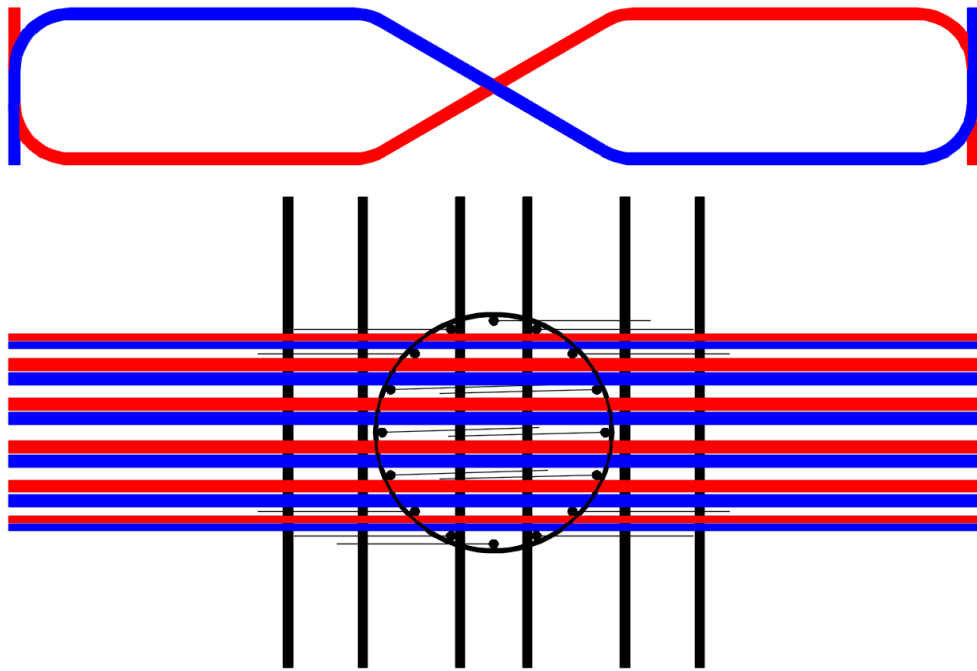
Footing Longitudinal and Joint Shear Z-Bar Installation
